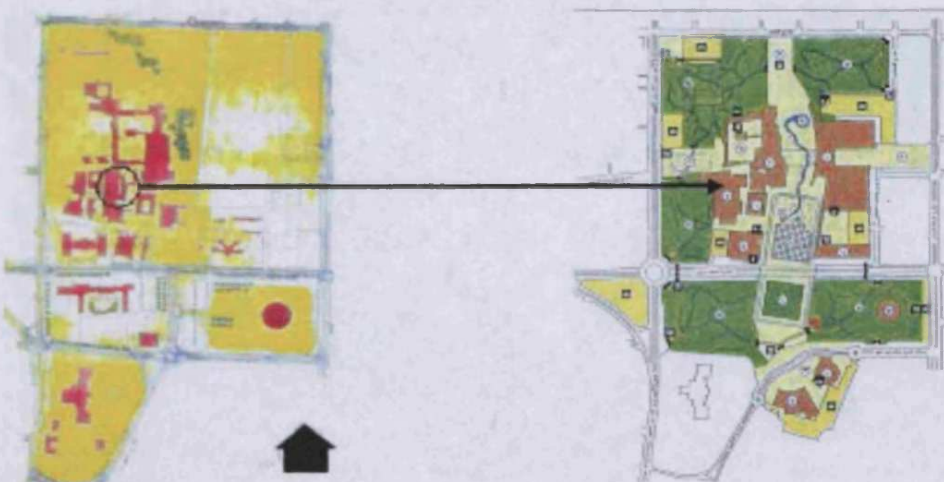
The three buildings site plan before and after restoration. Source: ADR modified by the author ⁽⁶⁻³⁾.
